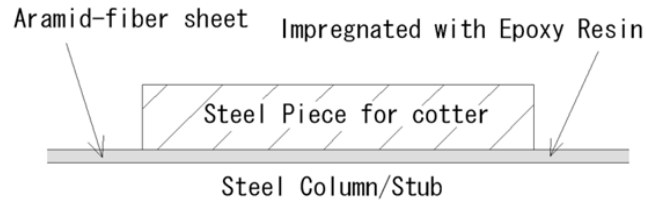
Cotter of the joint between columns and stubs and precast wing walls
